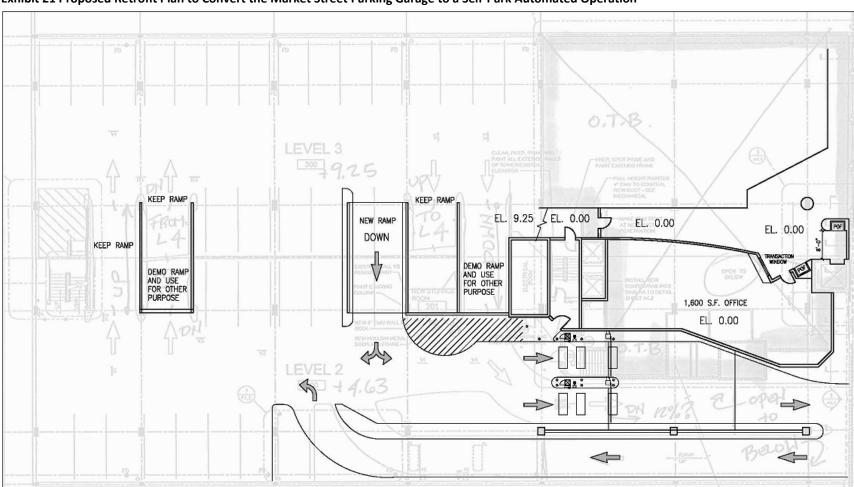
Proposed Retrofit Plan to Convert the Market Street Parking Garage to a Self-Park Automated Operation
